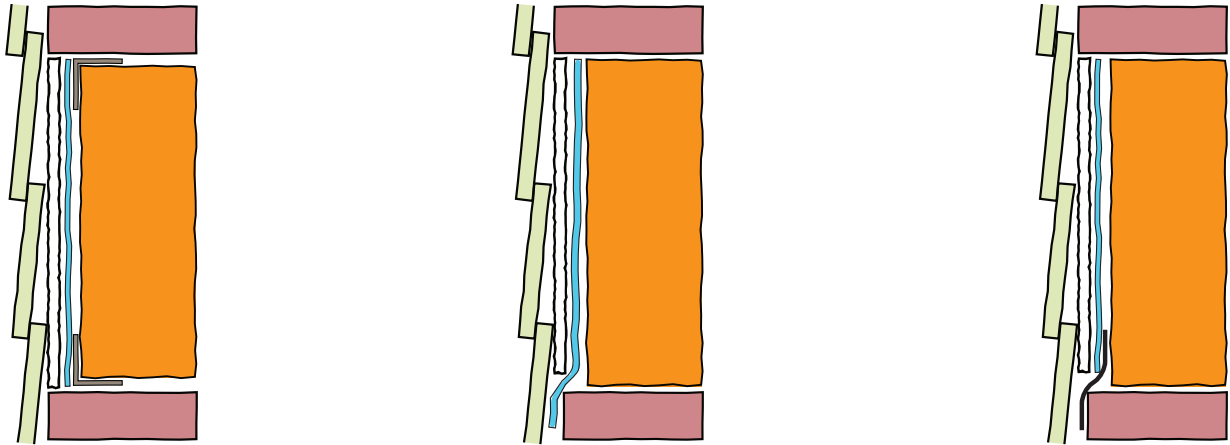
Water-repellent drainage plane mesh that is located behind the cladding to aid drainage of water passing through the cladding down the wall and out to the exterior.
